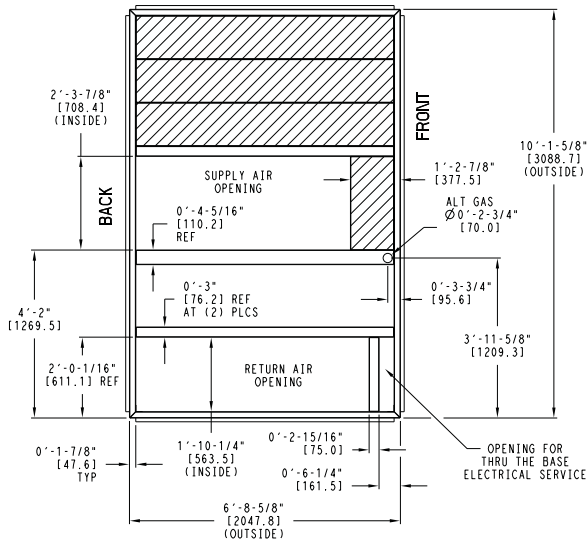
Dimensions 50LC*B14, Sheet 3 of 3
